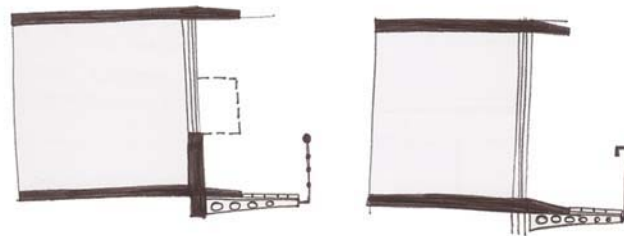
& 8: Pre-fabricated steel components extend past the existing structure to achieve additional space
